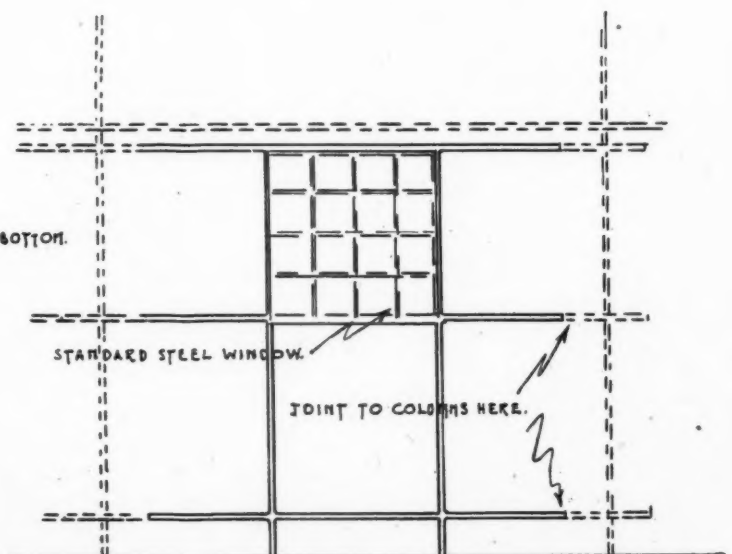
the dotted lines represent the gable-end frame, which is also supplied in prefabricated sectional units. Asbestos sheeting is used as an external covering for the walls and roof, and a notable feature of this form of construction is the extremely simple method of fixing the external sheeting. The steel tonnage employed is 5.5 and estimate for delivery and erection (complete with all external sheeting but excluding glazing, gutters
